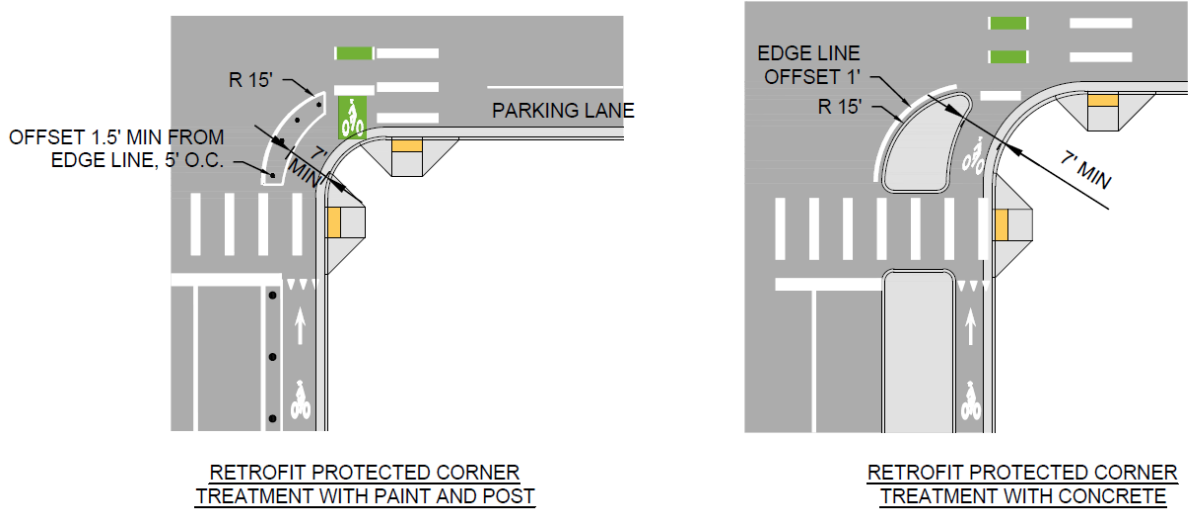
Typical Layout of Street Level Separated Bike Lanes at Intersection in Retrofit Conditions
